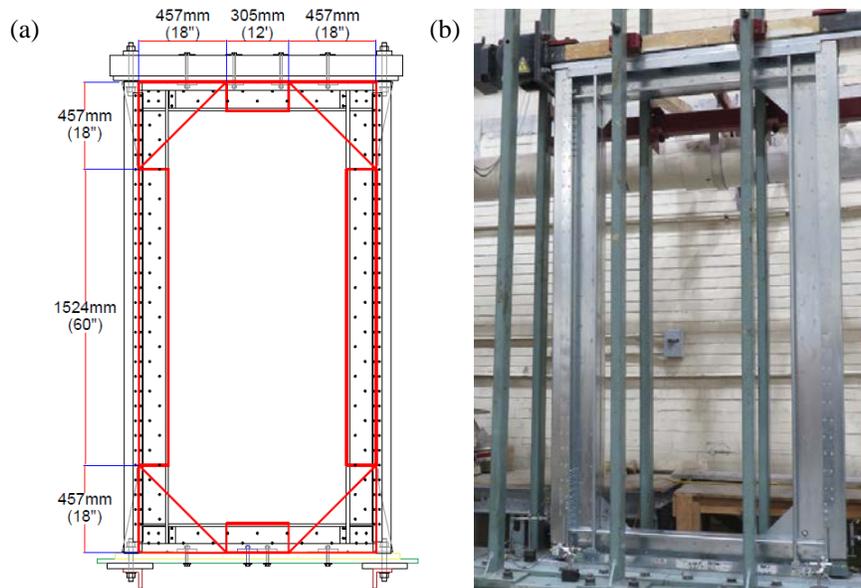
Frame-only shear wall W37F : (a) configuration and dimensions, (b) specimen installed in test frame
